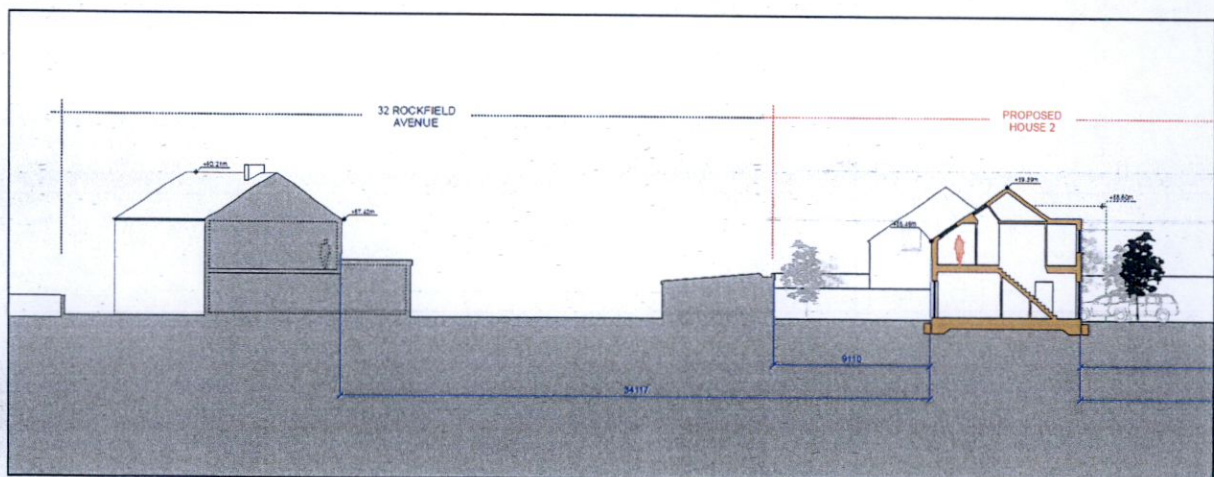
Extract of Updated Contiguous Site Section Drawing (see Appendix III).
